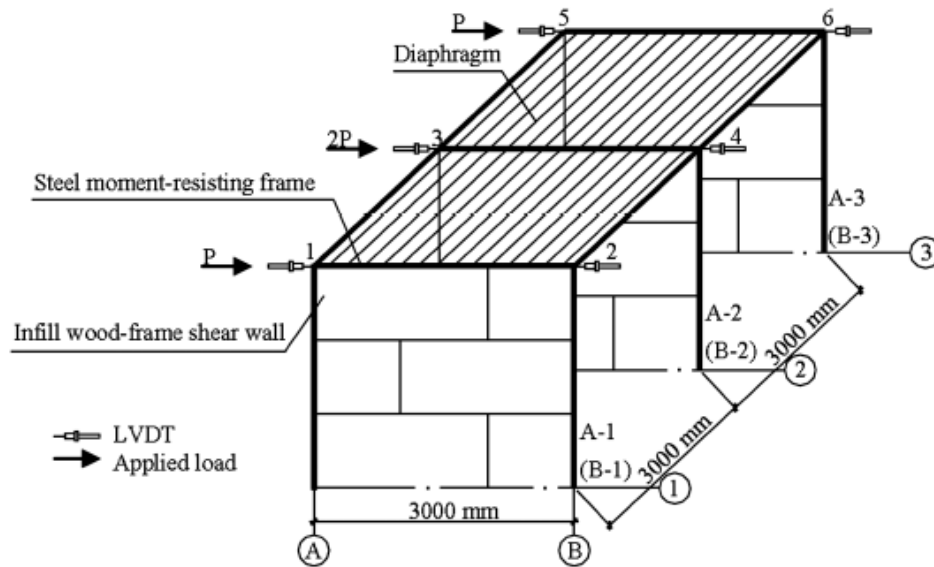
Structural configuration of a timber-steel hybrid shear wall with plywood infill walls
